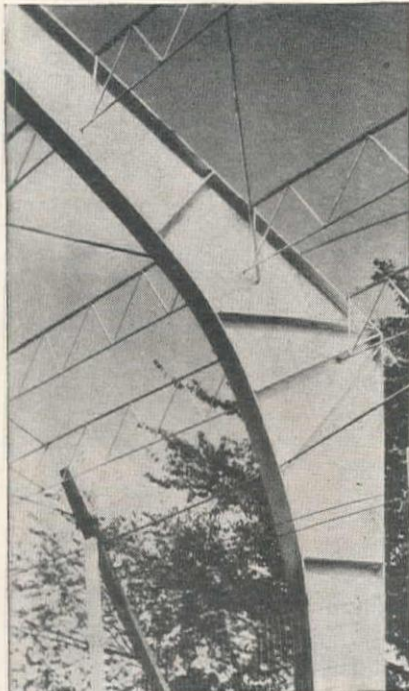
Arc welded arch frame showing connections of bar steel purlins.
